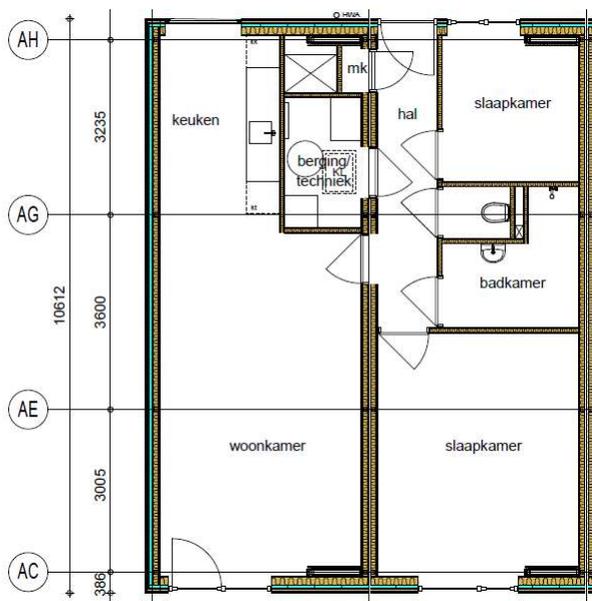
Functional floor plan (Pieters Bouwtechniek).
